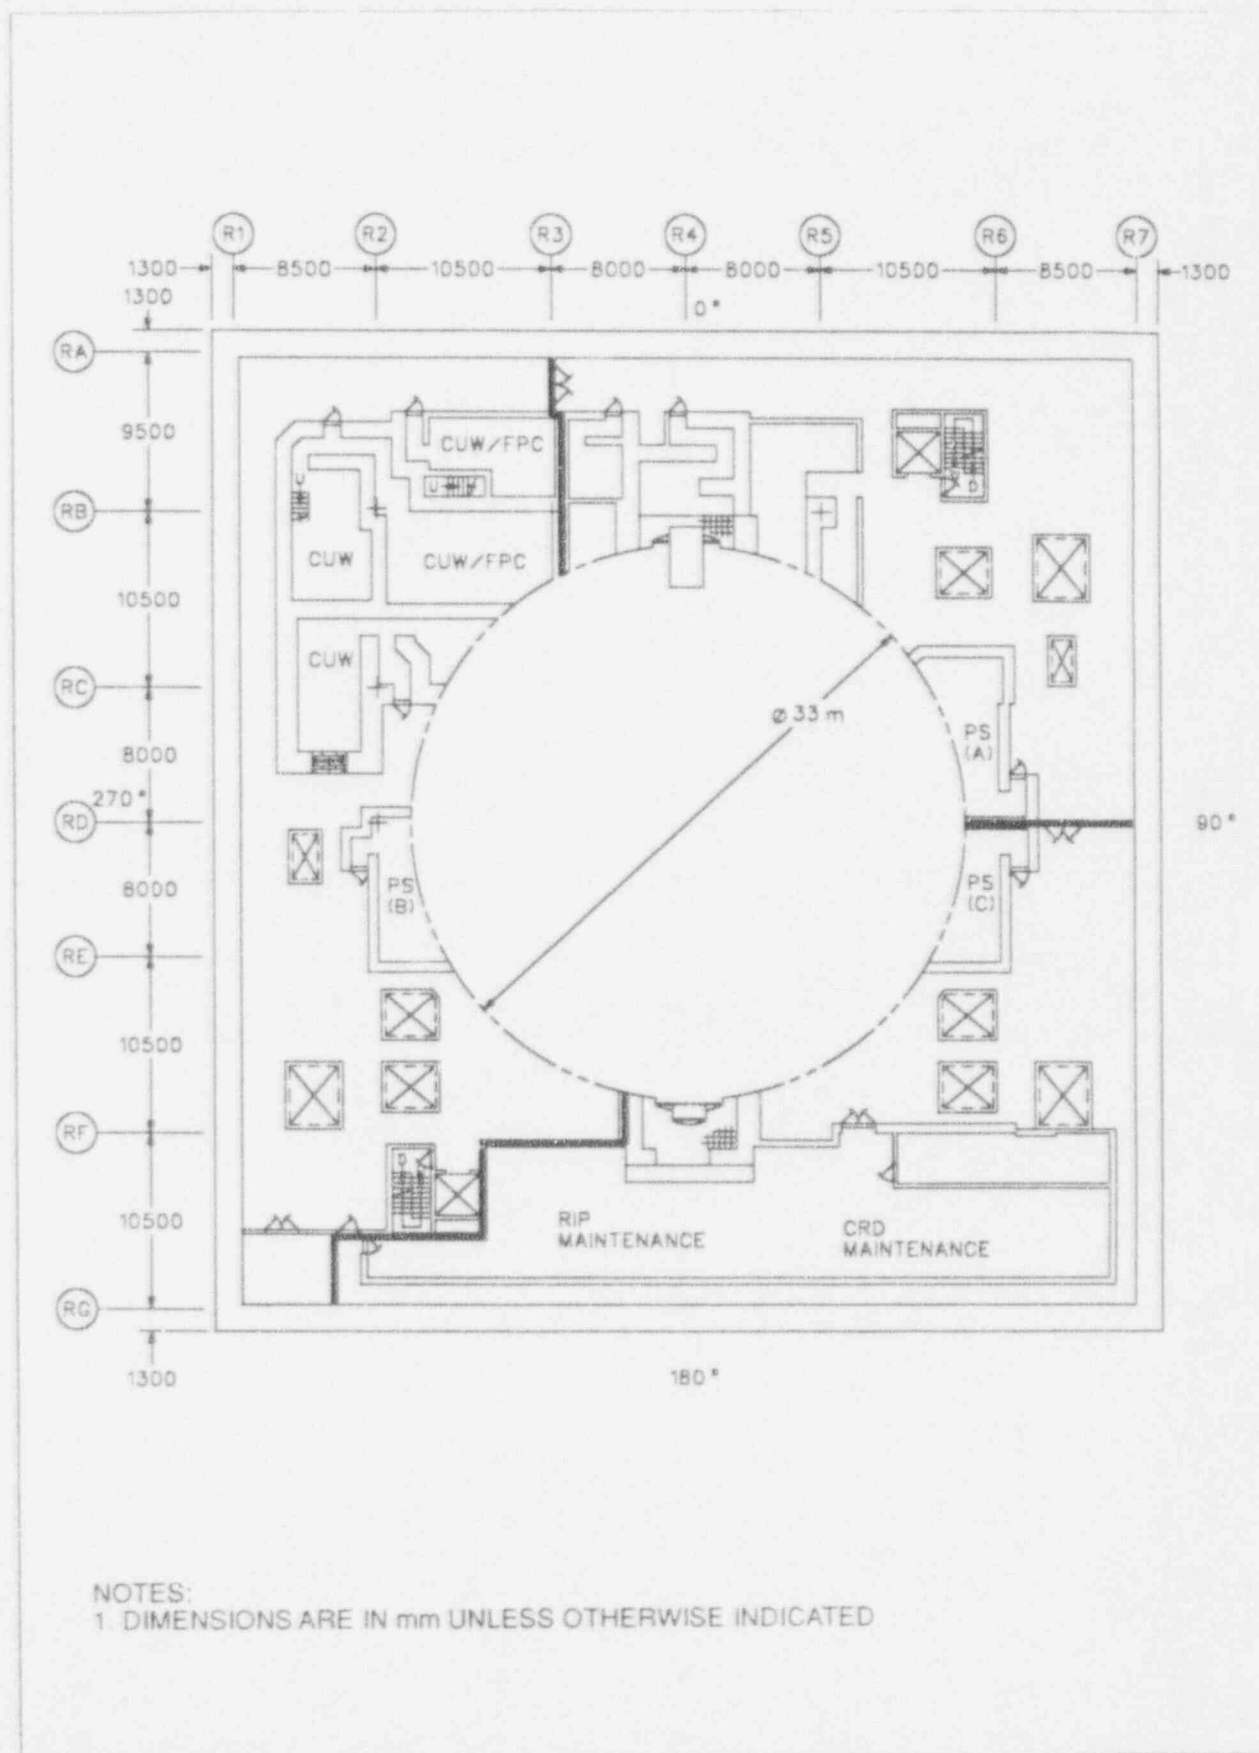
Reactor Building Arrangement Floor B2F—Elevation -1700 mm
